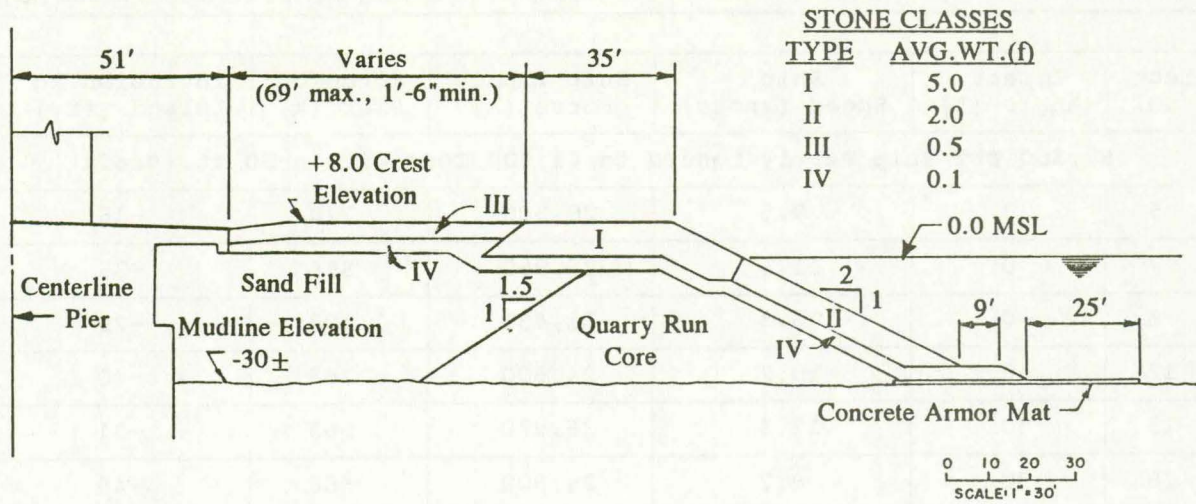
Sunshine Skyway Bridge Protective Island Typical Section [24].
